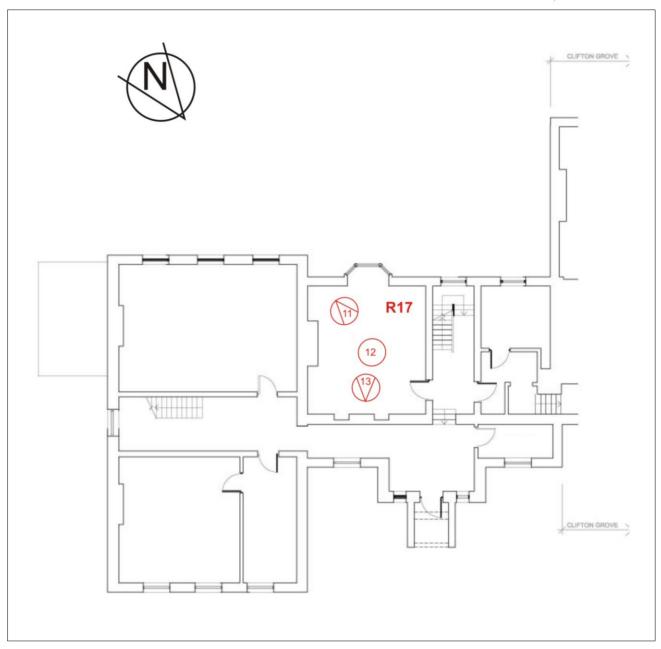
Ground Floor photo location plan (Base Plan © 105 West Architects Ltd)
